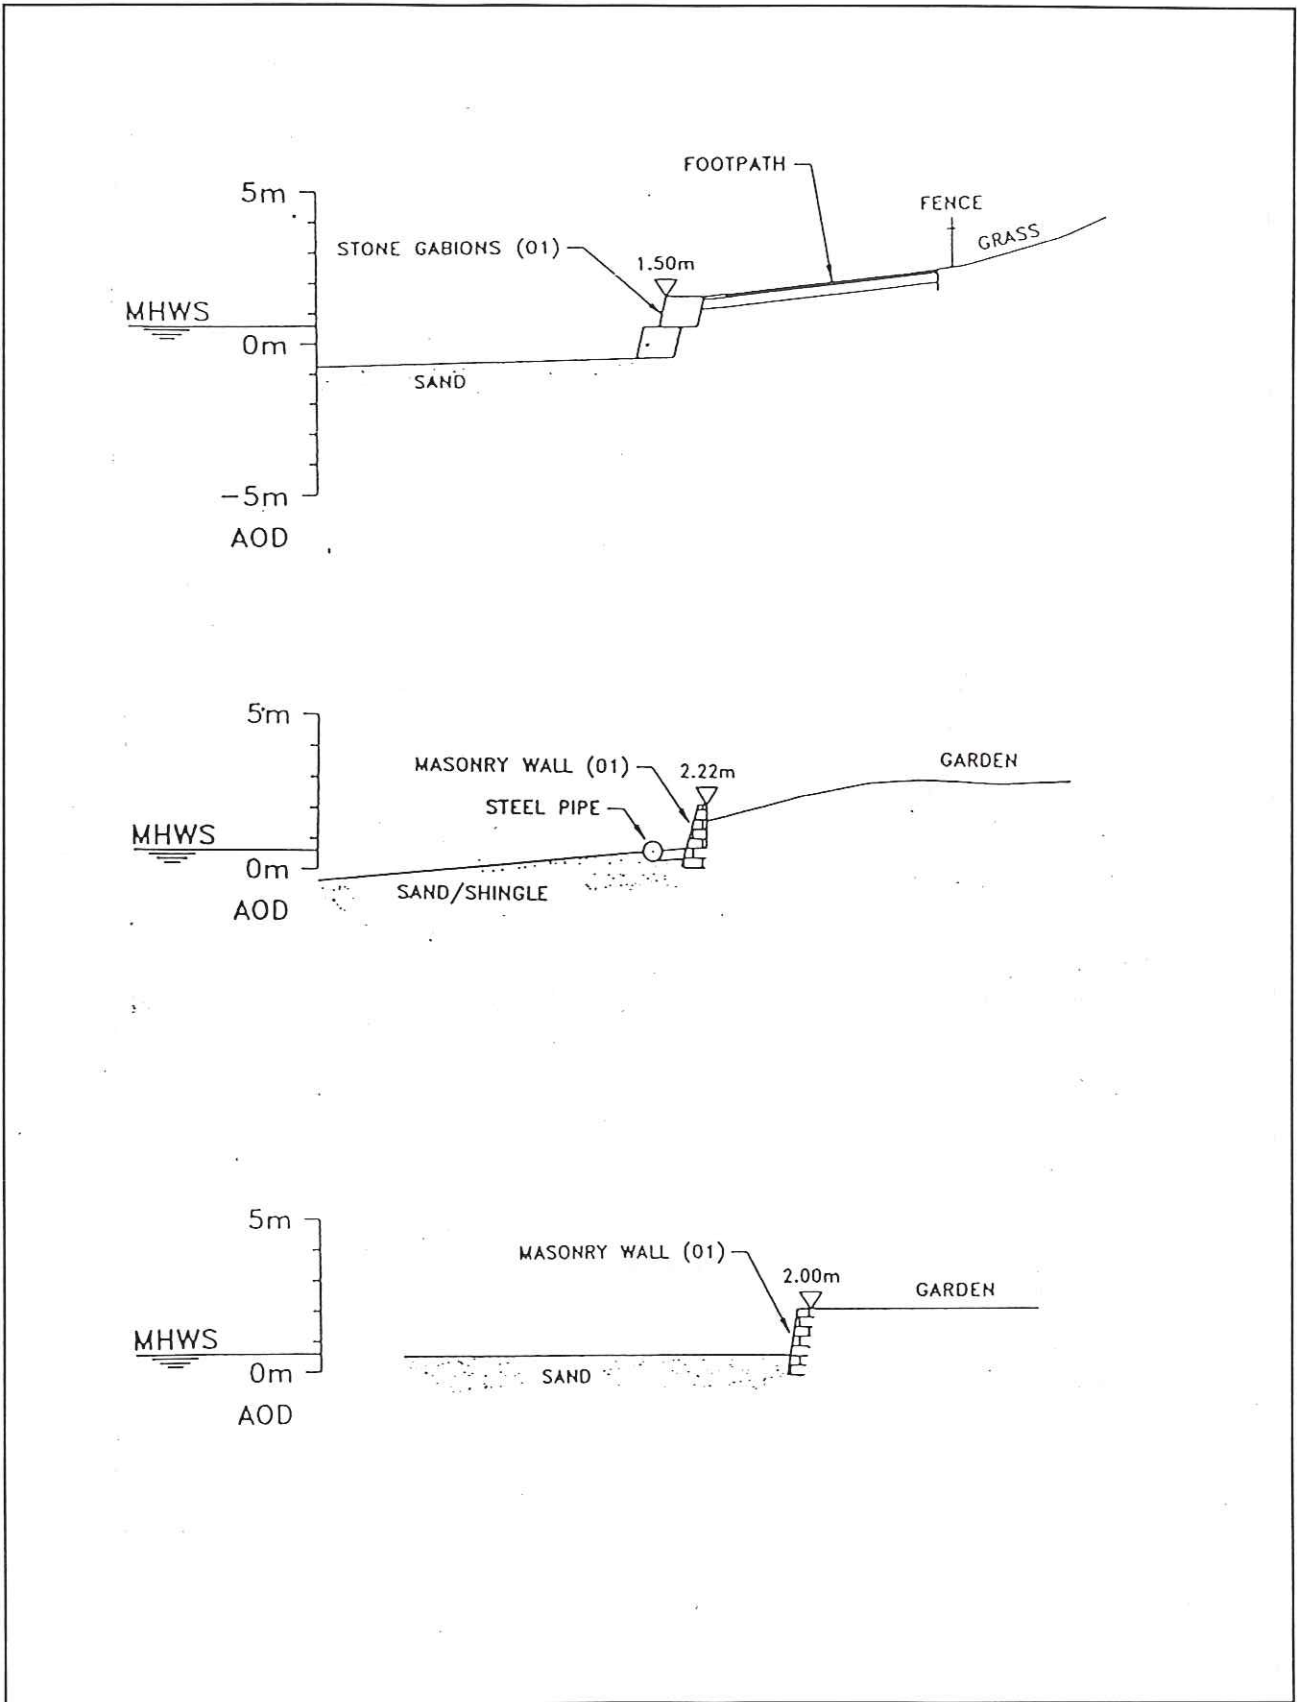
Seawall cross-sections 5/2, 5/4 and 6/3
